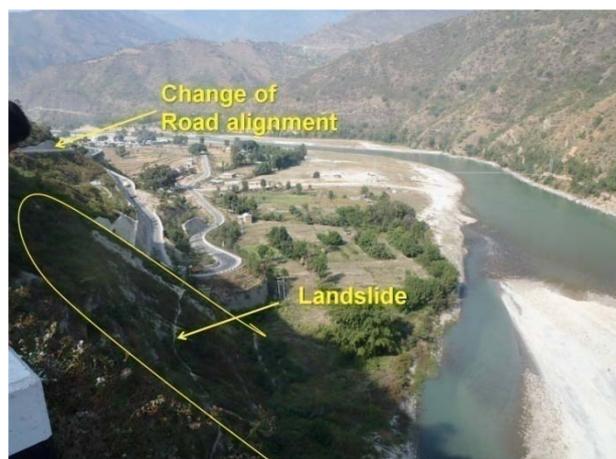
Change of road alignment to protect from landslide, Sindhuli Road, Sec. III, Mulkot.
